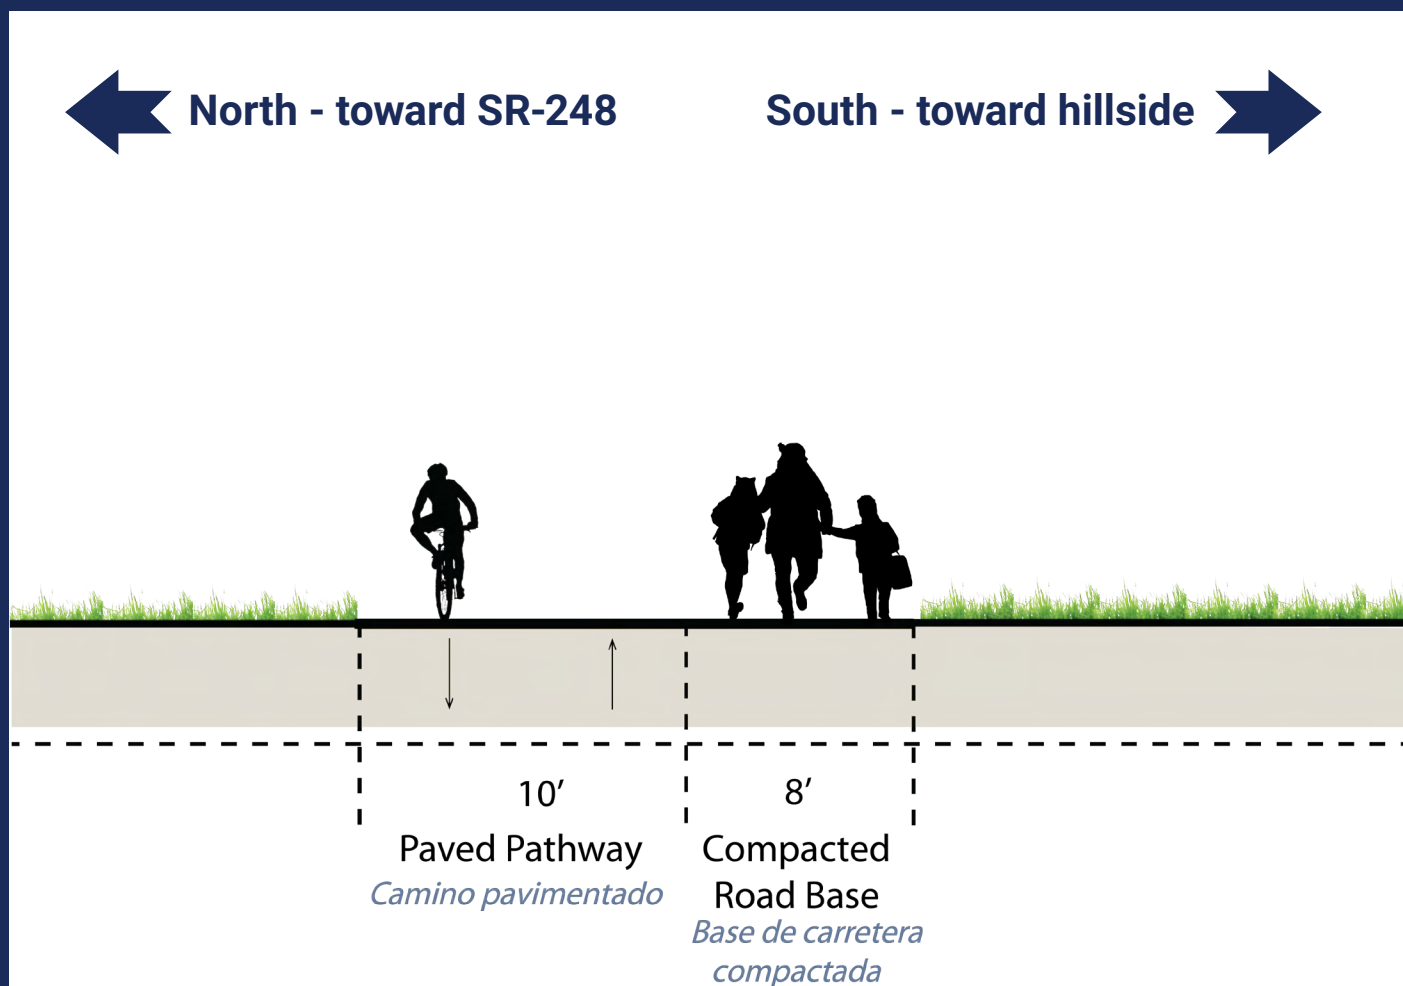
Proposed Typical Rail Trail Cross-Section (Source: GSBS Architects)
